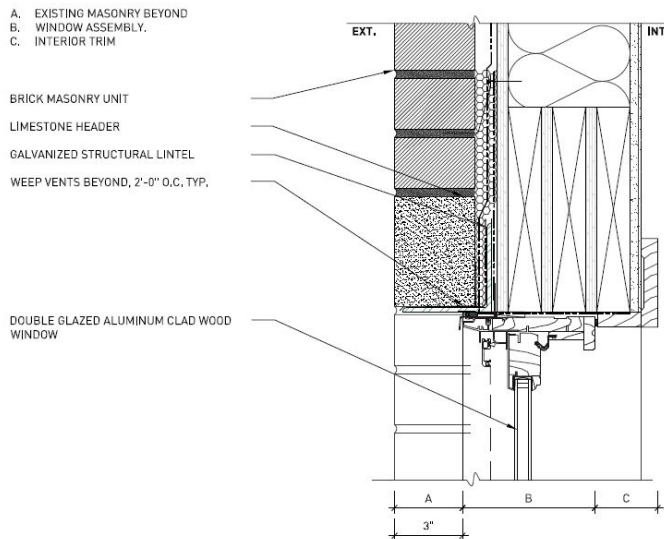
, by Applicant 2023: Window head detail, showing 3” recessed inset from exterior wall.
